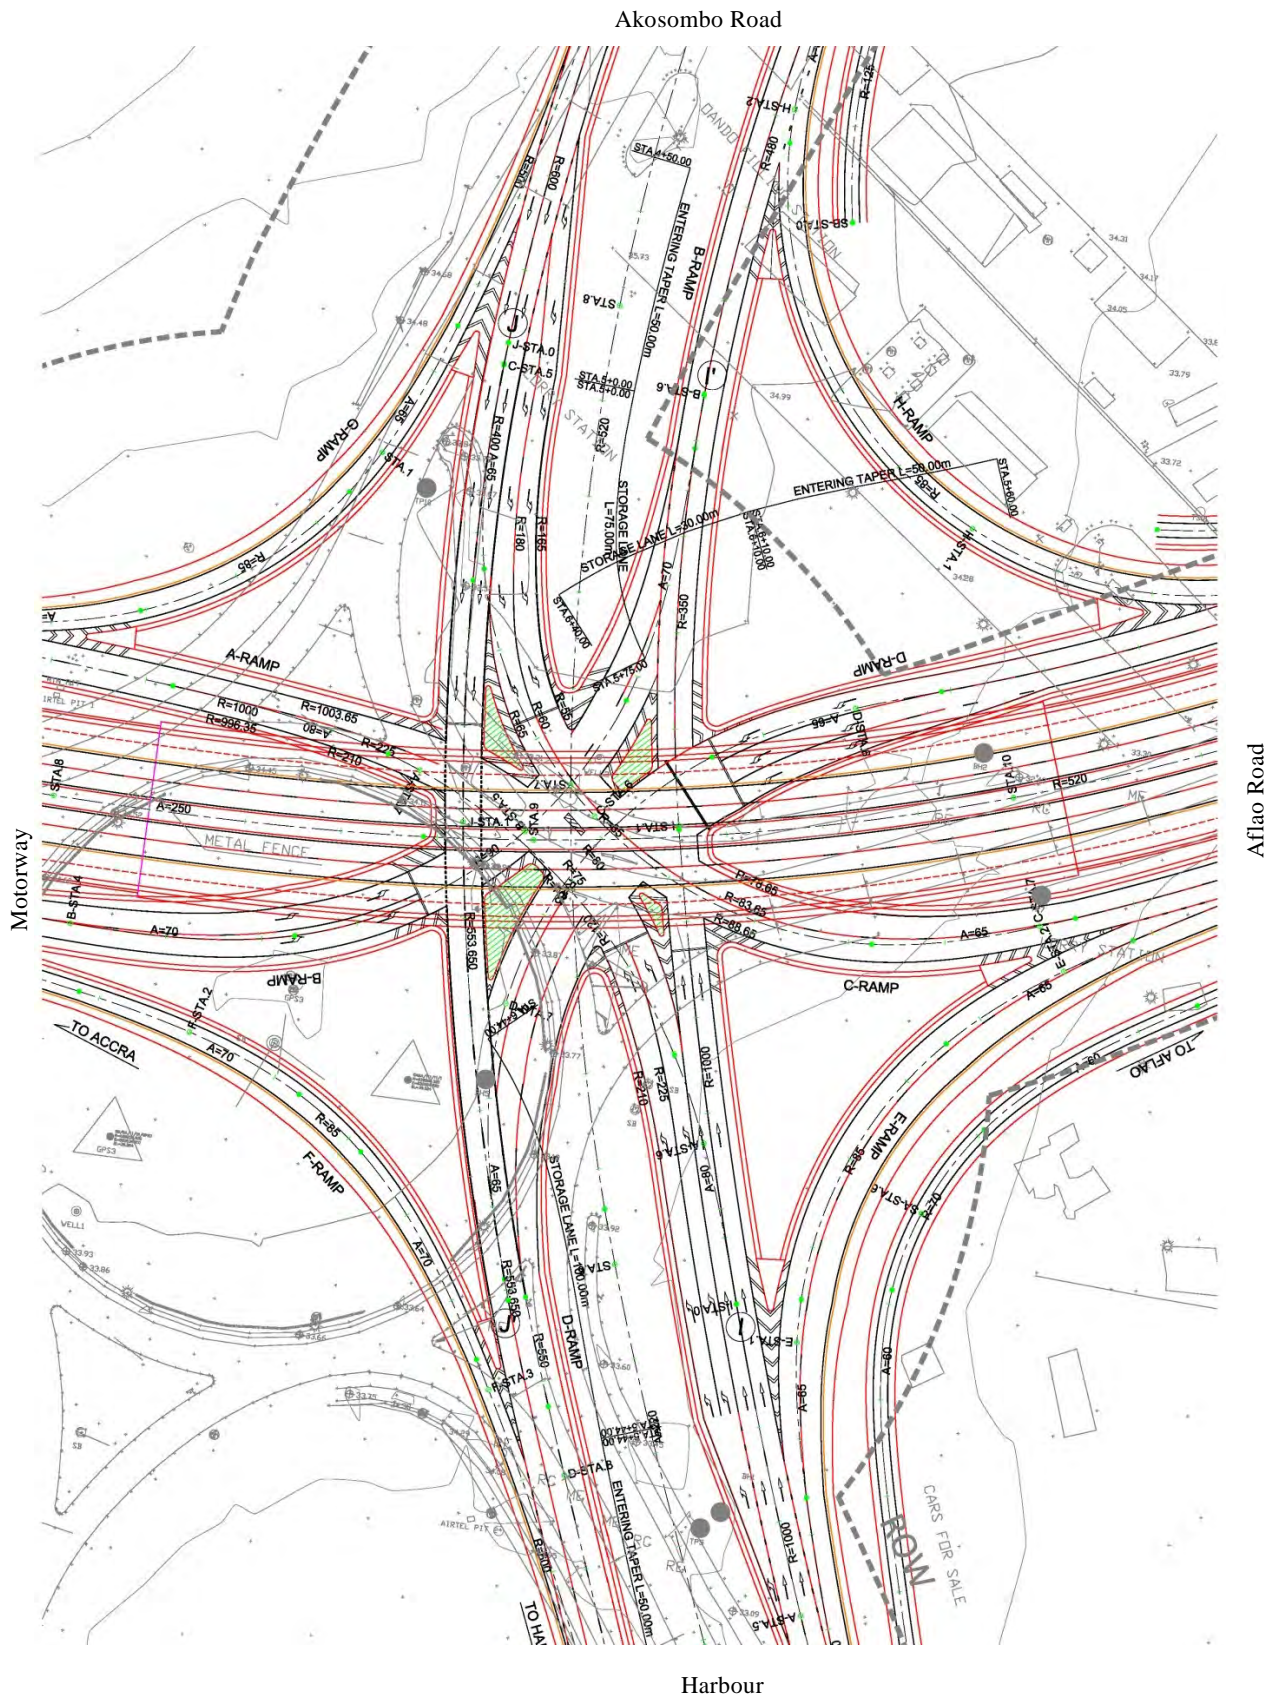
Traffic Signal Layout Plan in Phase-1
